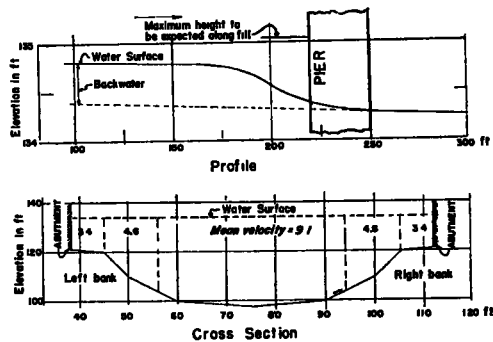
Water Surface Profile and Cross Section at Bridge Sites
